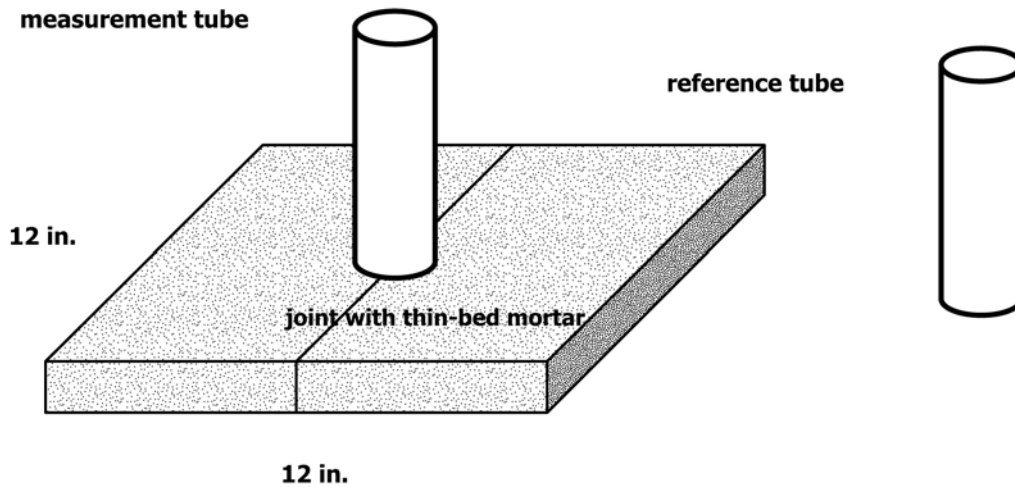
Masonry Assemblage for Testing Liquid Permeability of Exterior Surface Treatment for AAC Masonry
